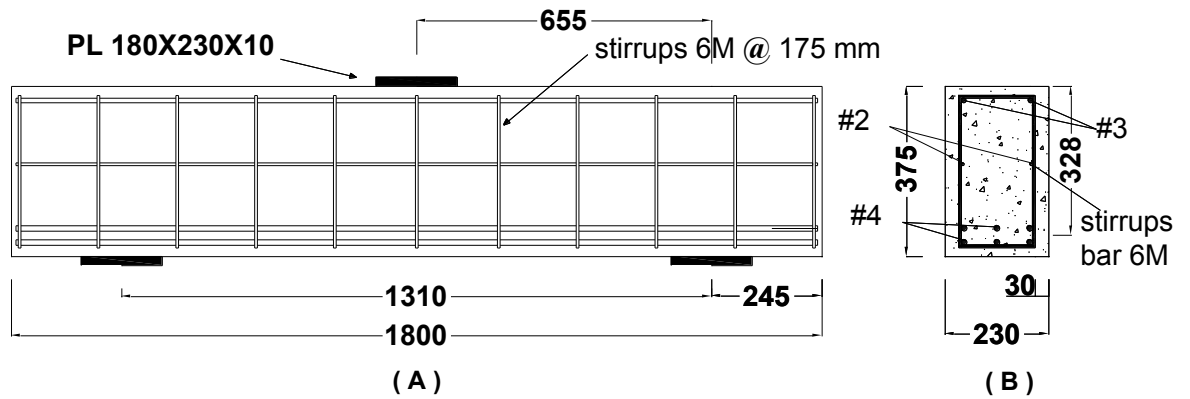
Beam C2/100: (A) elevation (B) cross section
